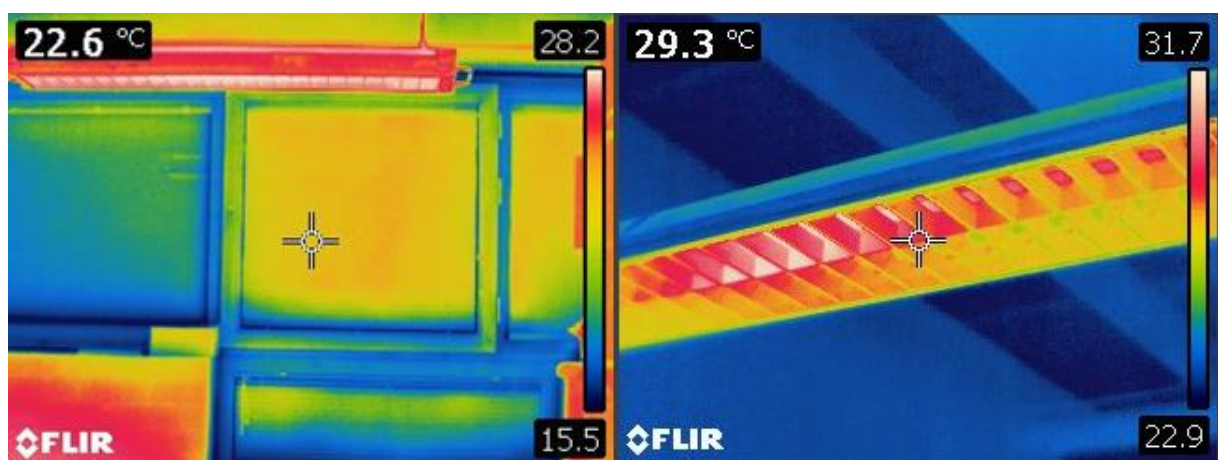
Part of the window wall (left) and one of the ceiling lamp fixtures (right) as viewed with an IR camera
